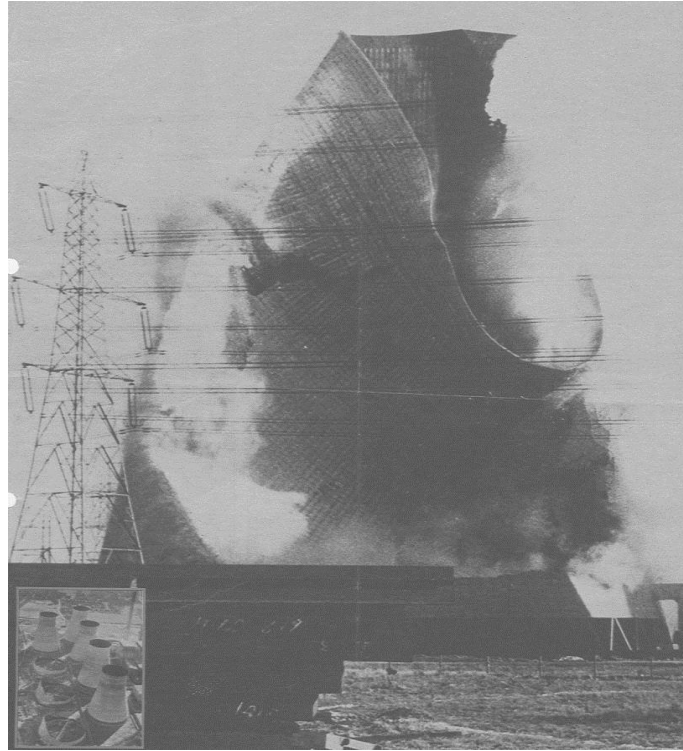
Ferry-bridge reinforced concrete cooling towers collapse due to wind
